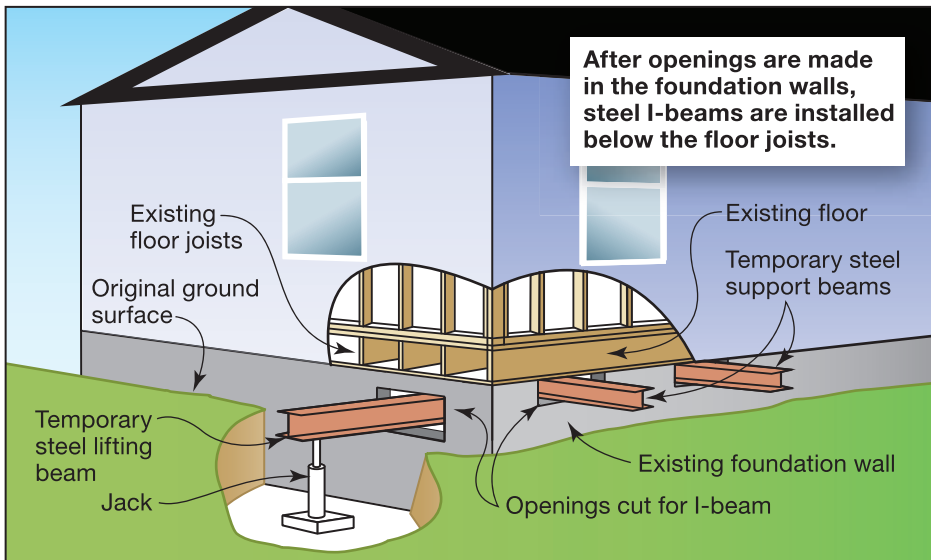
E-2. Step 1 of elevating an existing wood-frame house on extended foundation walls and piers: Install network of steel I-beams
